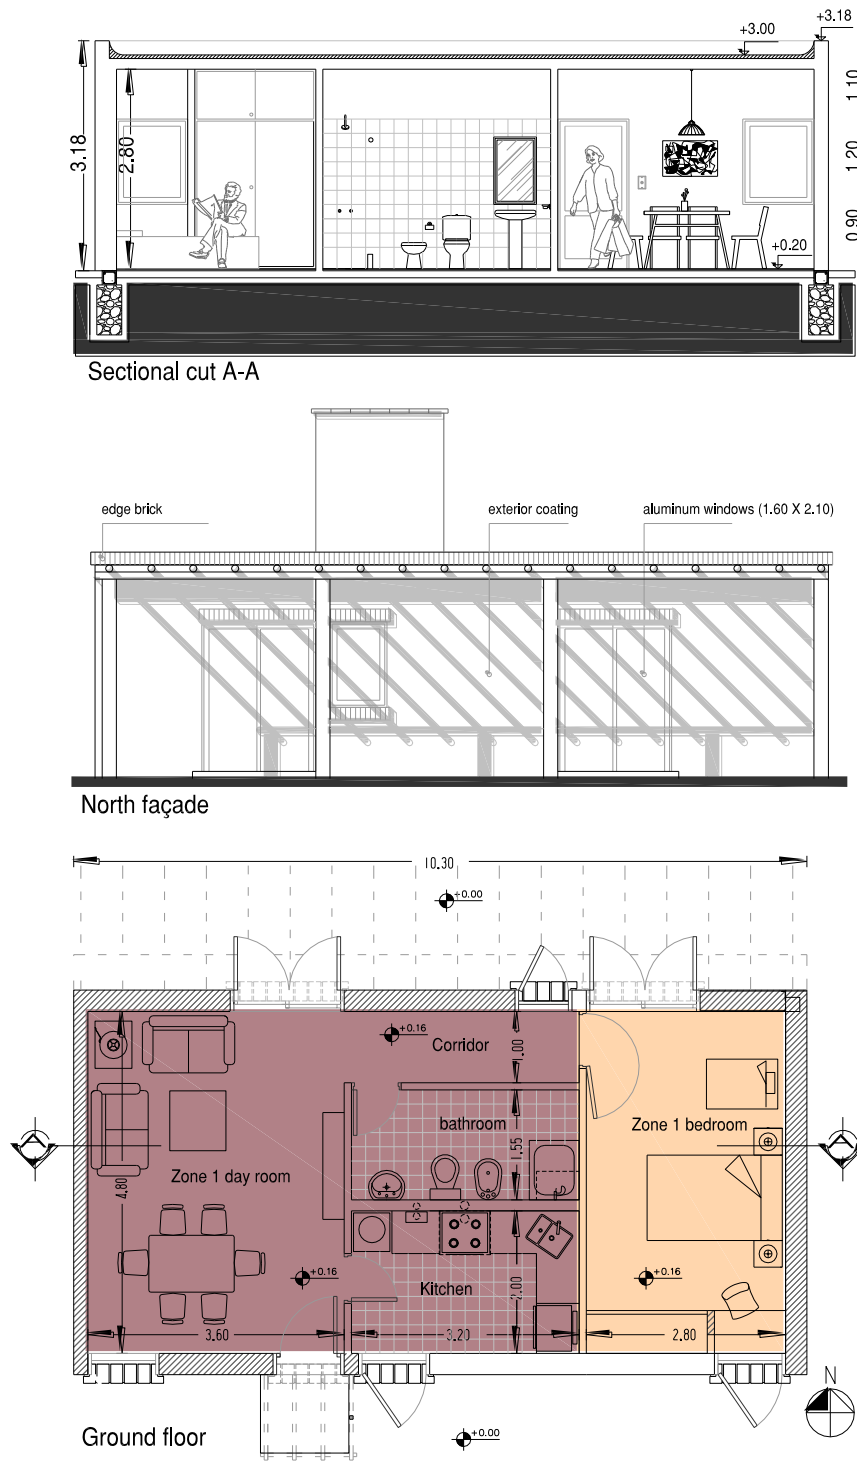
Sectional cut, north façade and, plan of the exemplary residential house.
